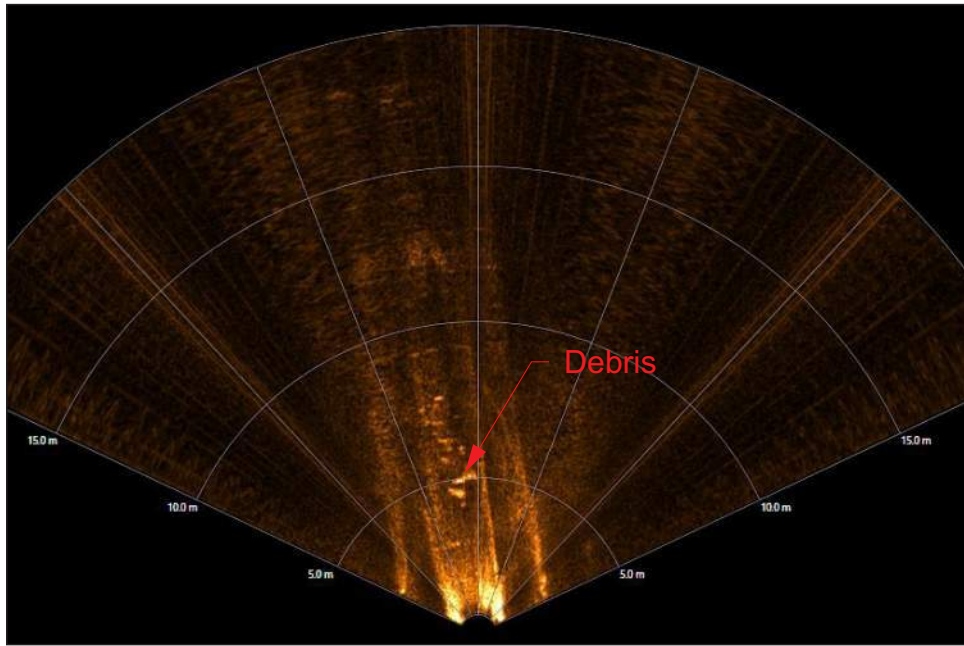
Sonar image at 96 feet downstream of Access Point 1. Debris on invert 17 feet ahead.
